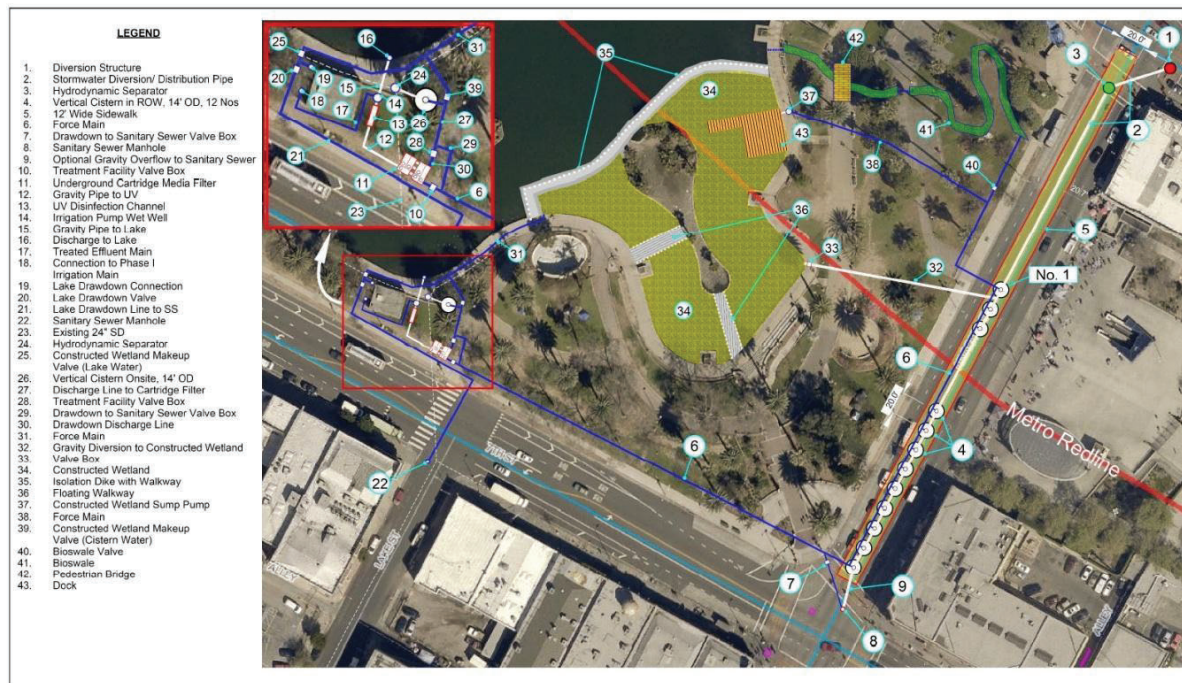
Proposed Site layout To be refined with outreach and Pre-Design Investigations (Source: Carollo Engineers, Feasibility study)
